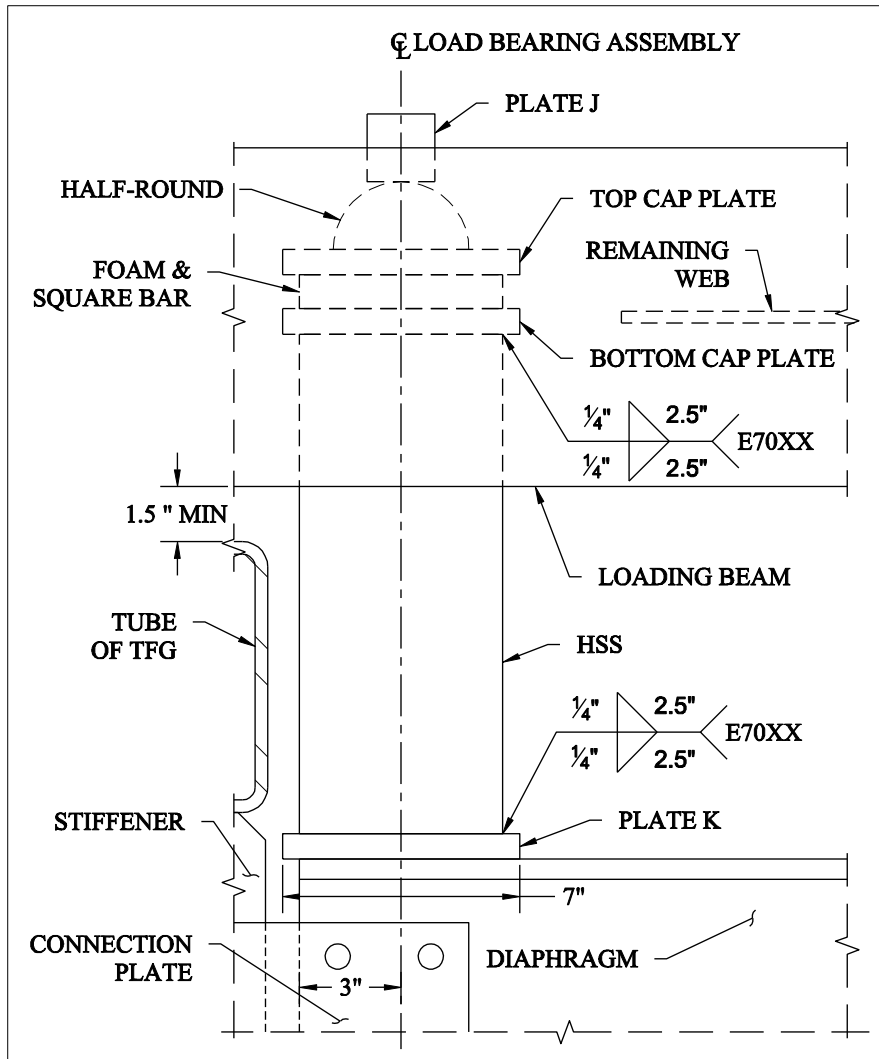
Parallel plane cross section view of load bearing assembly at Section A (Hampe, 2012)
